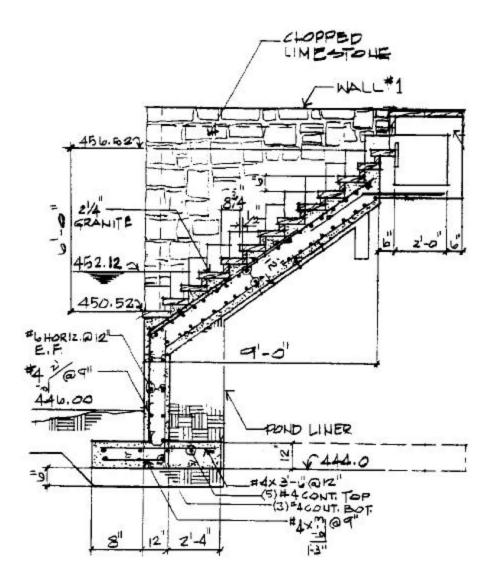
Example of Liner Installed Prior to Concrete Pour (Courtesy COA)
